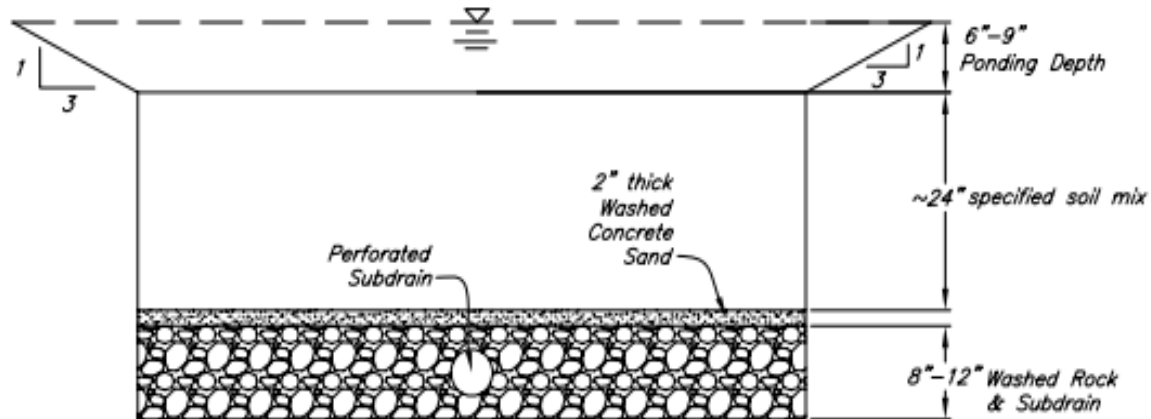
Typical Bio-Retention Cell Cross Section – Drawing provide from Iowa Rain Garden and Installation Manual (Iowa Storm Water Education Program, Iowa Stormwater Partnership, United States Department of Agriculture)
